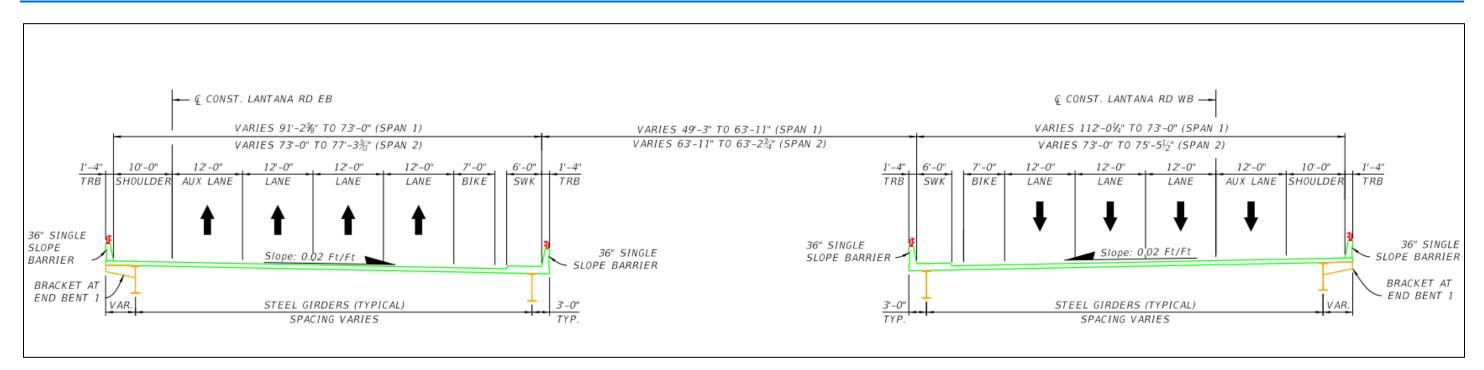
Build Alternative 2: Bridge Over SR 9/I-95 - Typical Section
